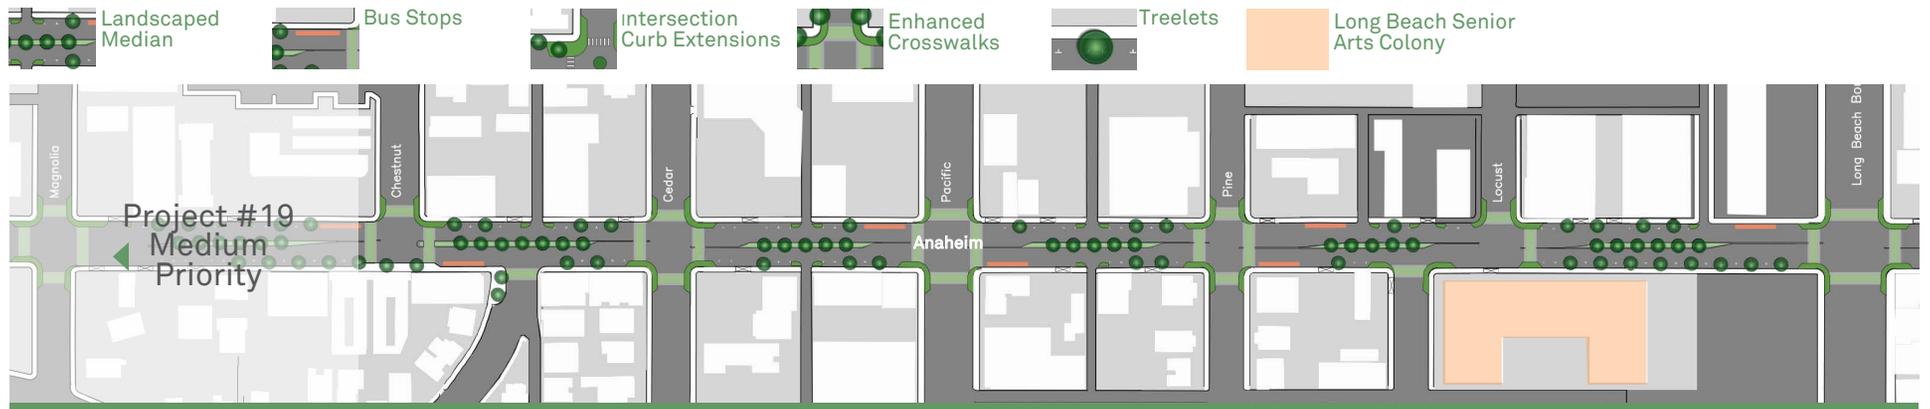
Anaheim Street - Typical Block Plan between Chestnut Avenue and Long Beach Boulevard
